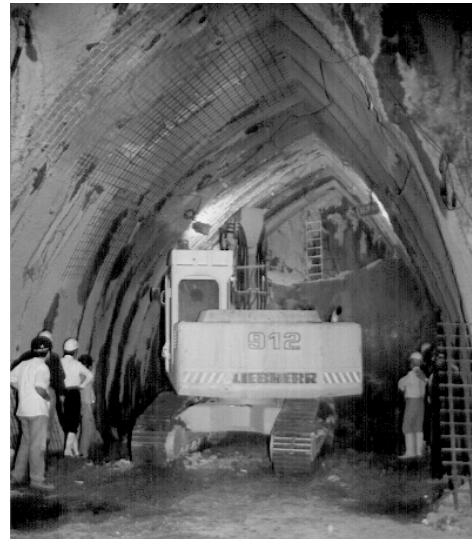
Side drift in the Athens Metro Olympion station excavation, which was excavated by the method illustrated in Fig. 17. The station has cover depth of approximately 10 m over the crown.
